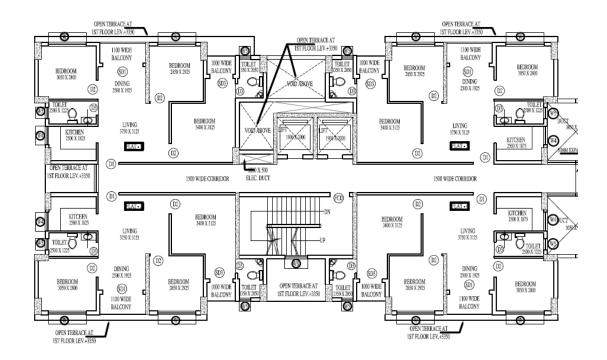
A Architectural Typical Floor Plan of Left Part of G+12 Storied Building
